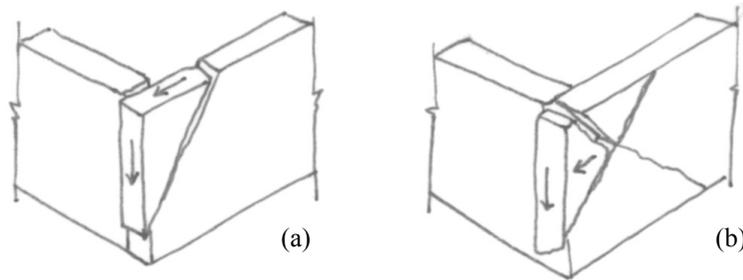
Damages of the corner wall sections after an earthquake: (a) vertical downward and horizontal displacement, (b) shear and flexural cracks
